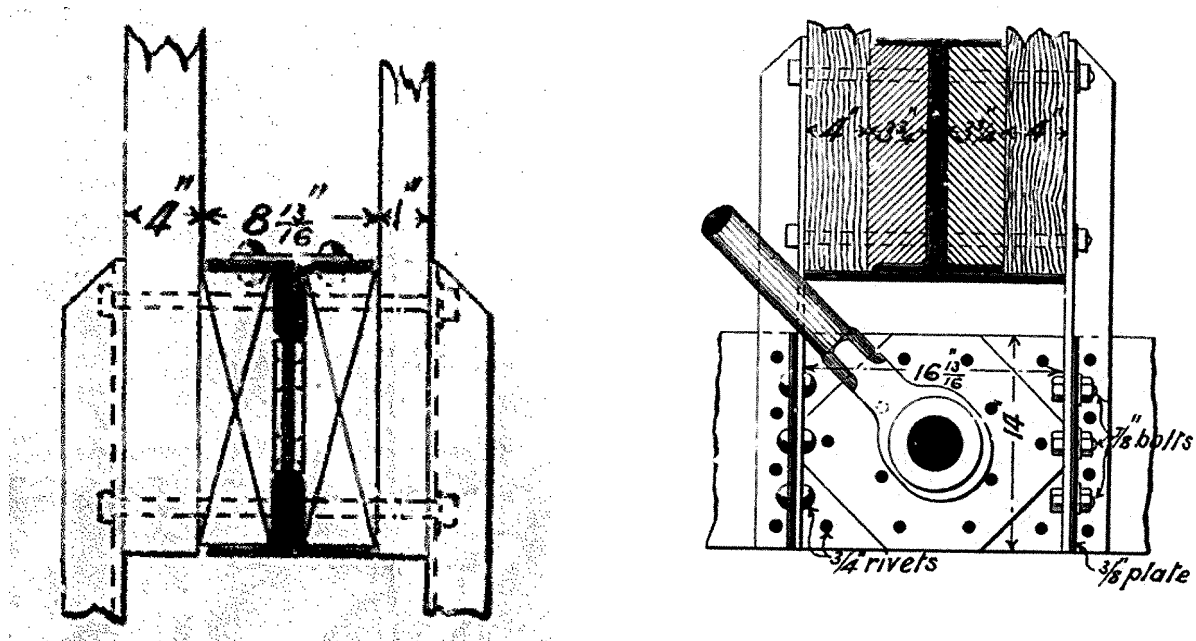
Details of Base Connection of Timber Struts with Bottom Chord and Metal Cross Girders
